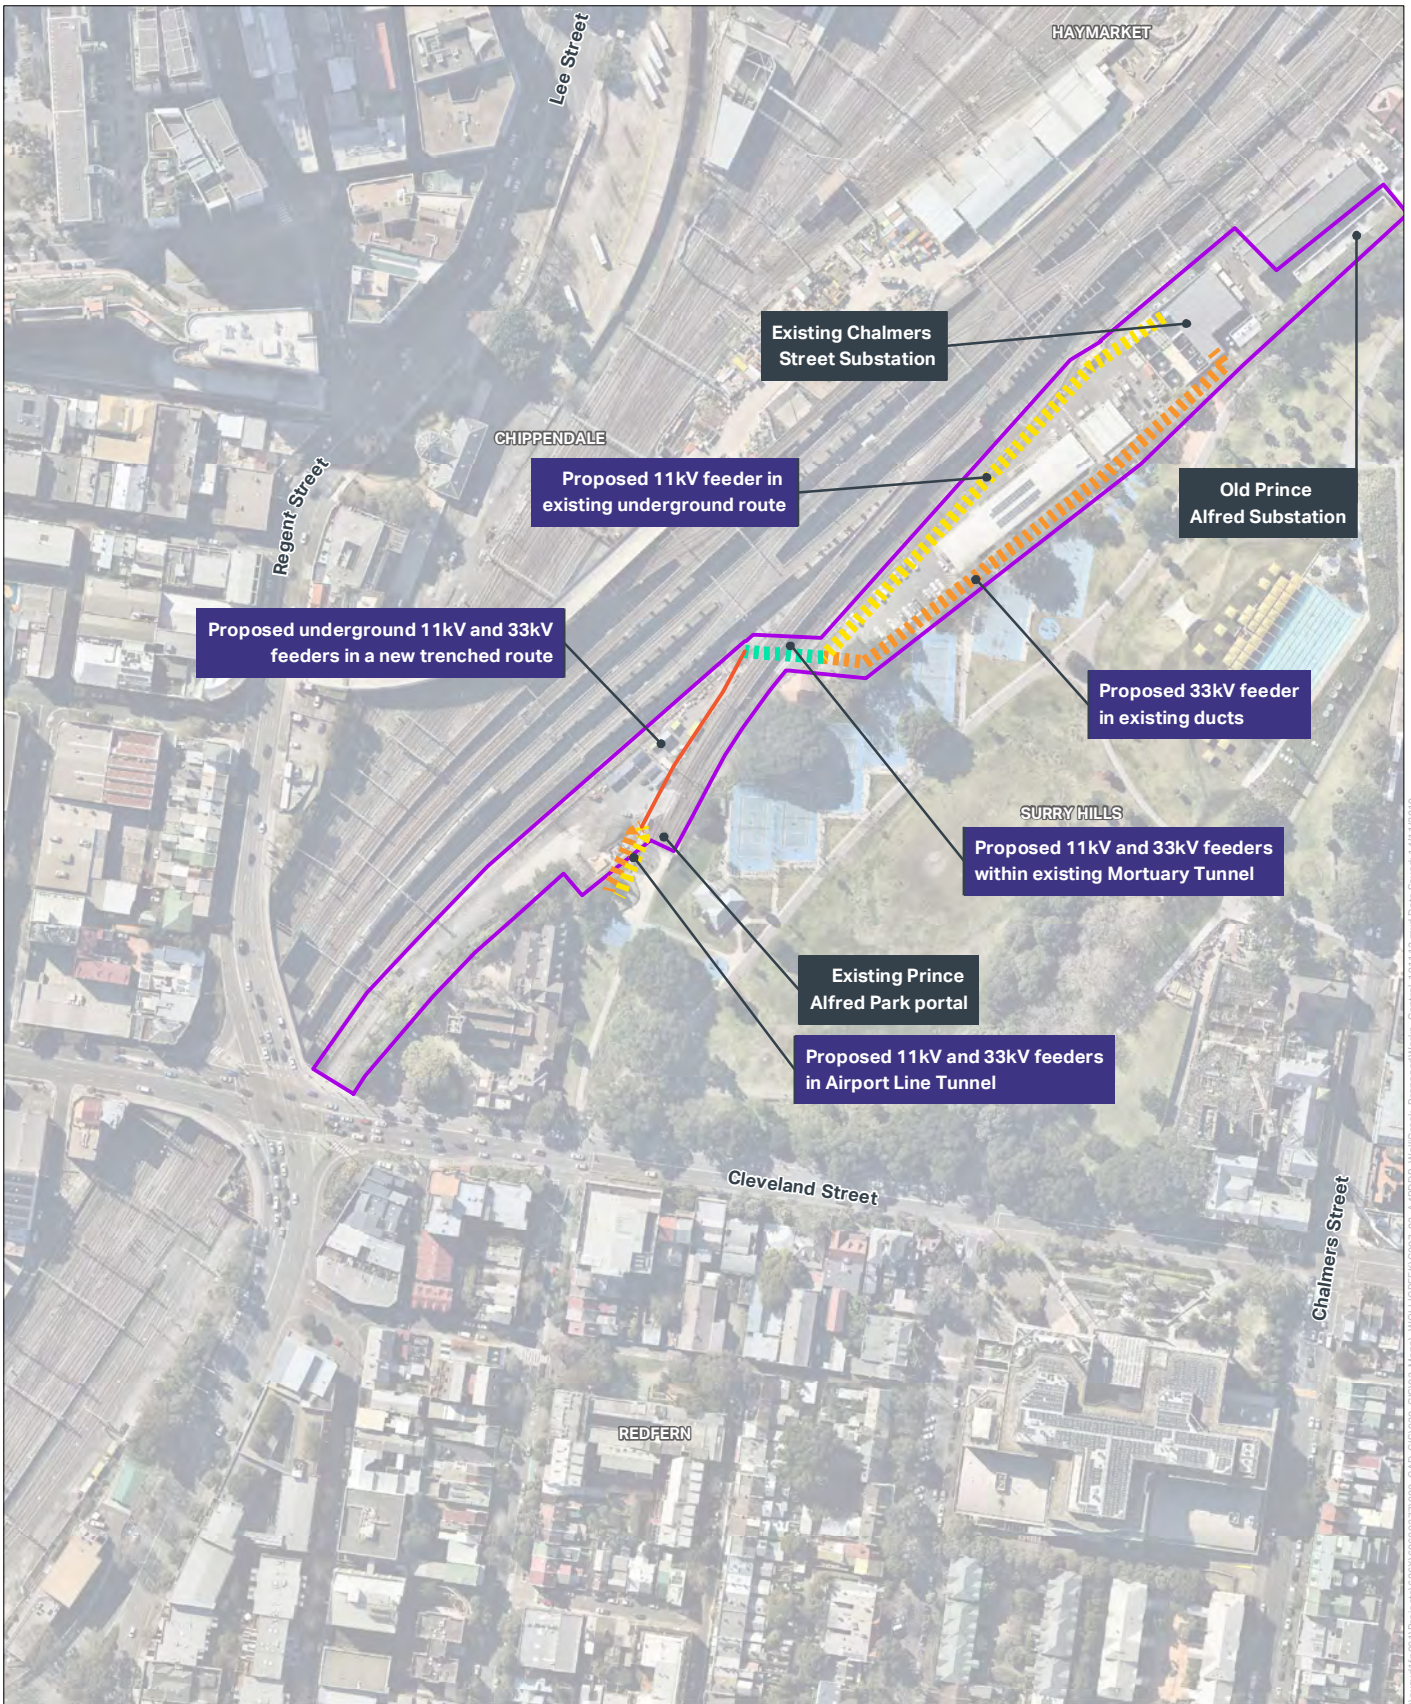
PROPOSED WORKS AT CHALMERS STREET SUBSTATION
